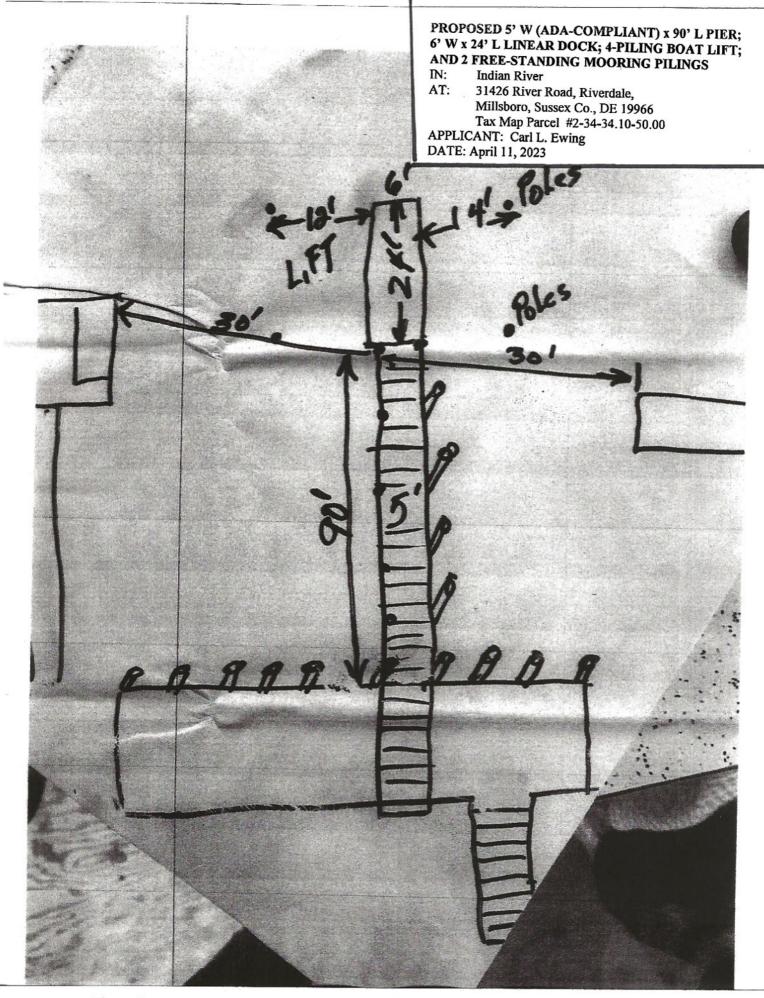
Plan view sketch of proposed project (prepared by applicant).
